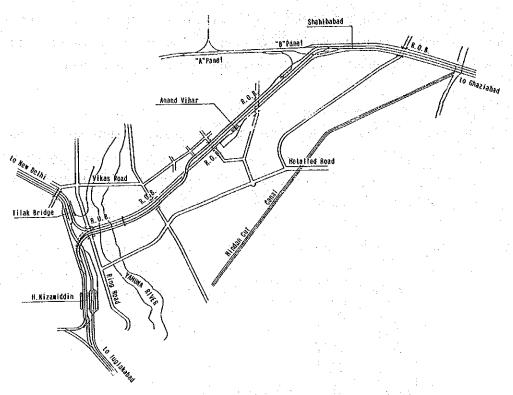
Conceptual Route-B Panel Improvement
